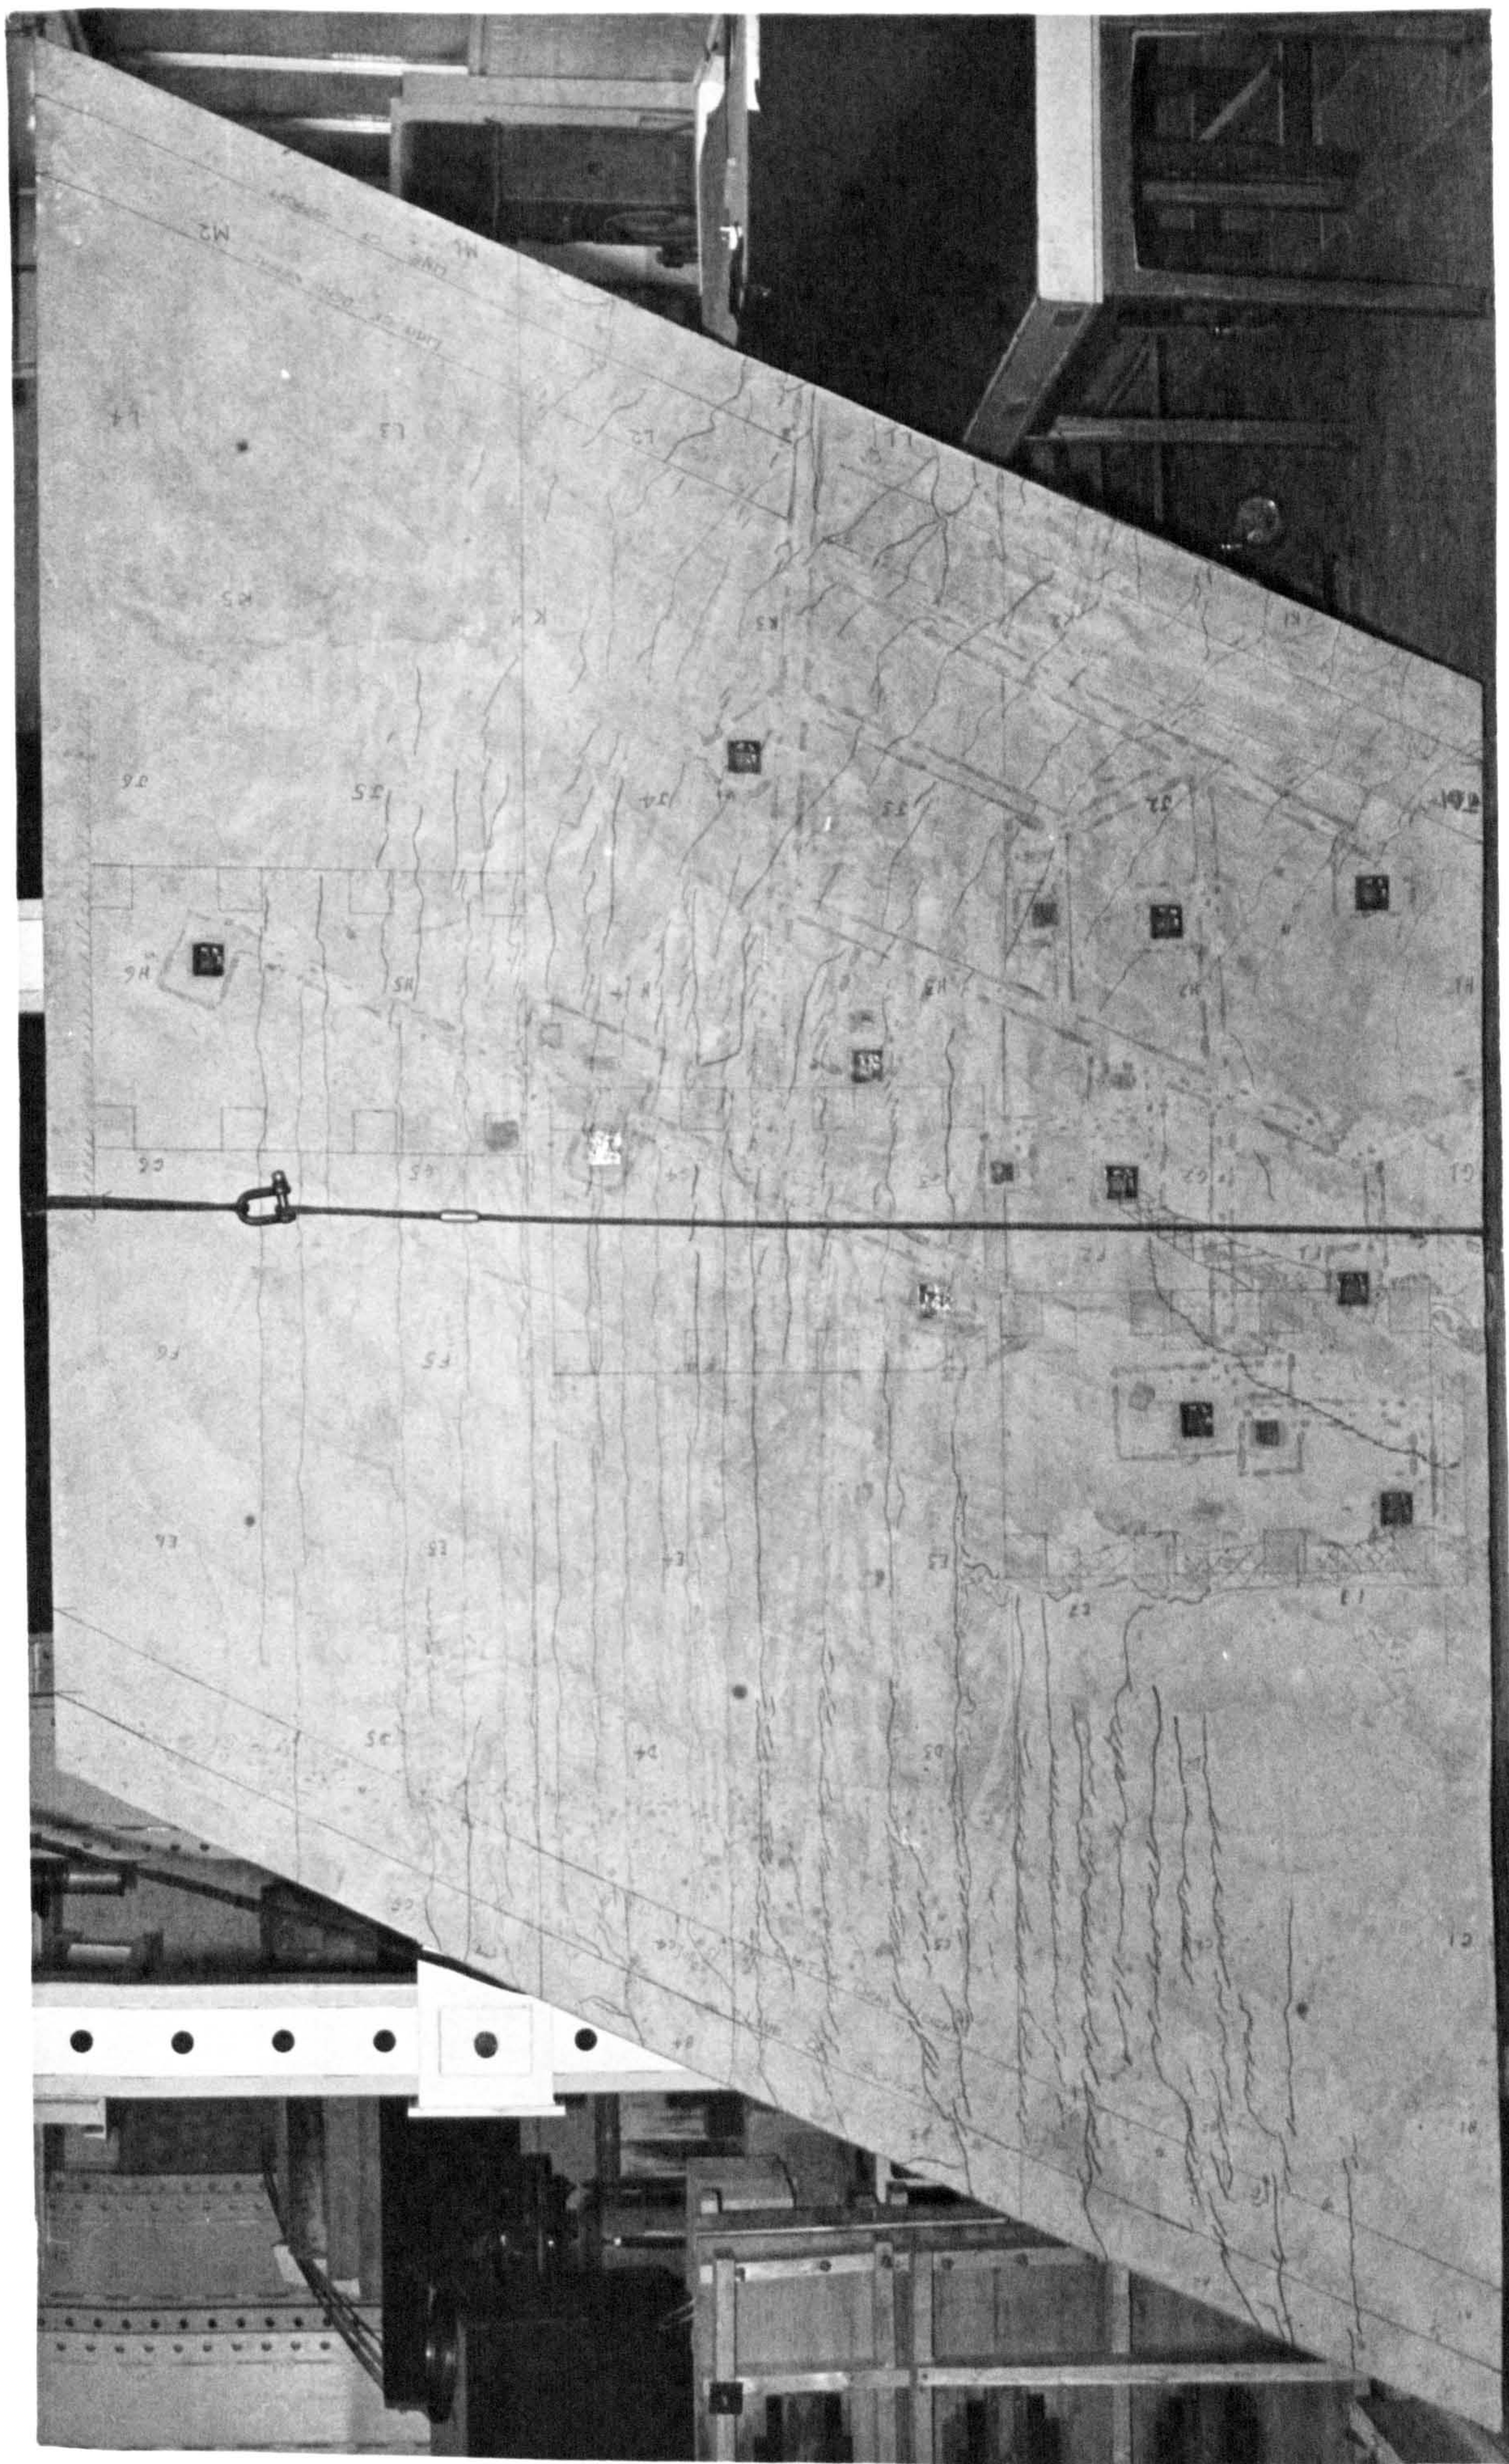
MODEL 1 TOP SURFACE CRACKING
